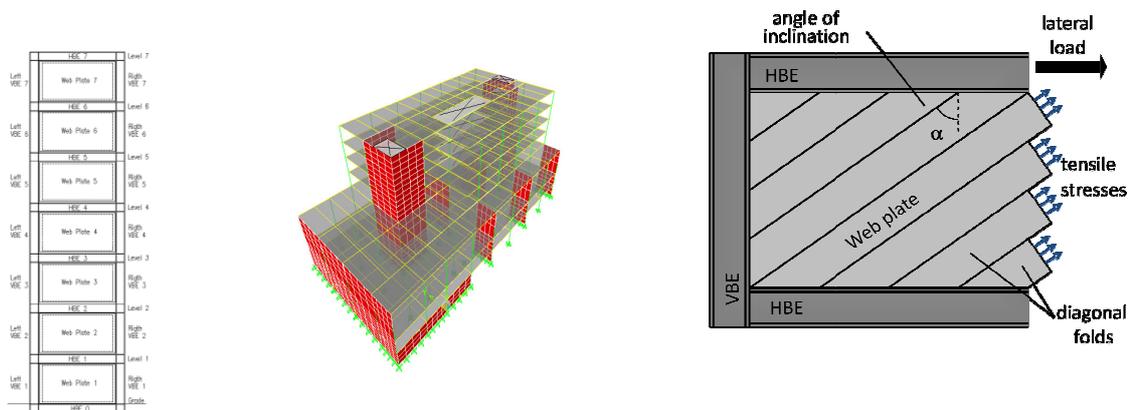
(a) An elevation view of typical Steel plate shear (b) Completed building with special moment frames the traditional Reinforced Concrete shear wall, and (c) SPSW Tension Field
